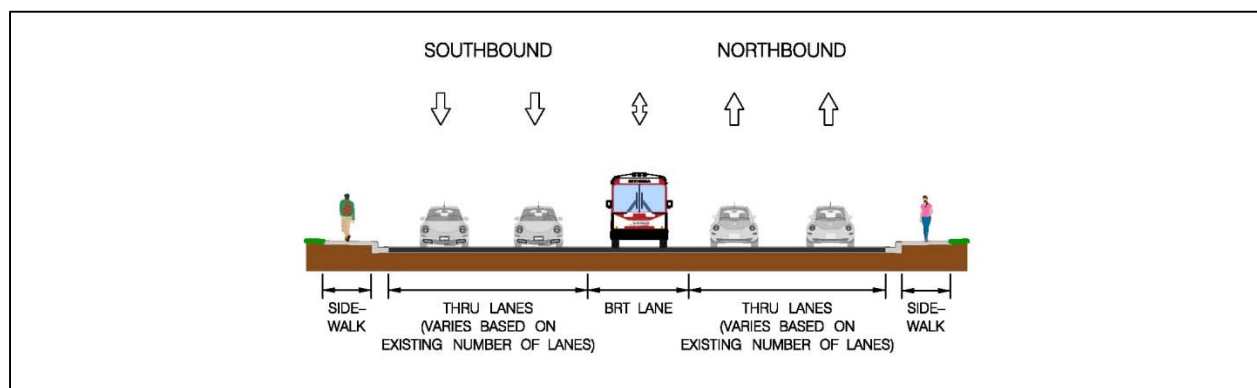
Alternative 4B - Section 4: Shady Grove / Rockville
